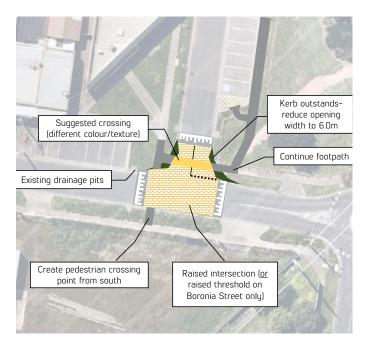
Alexander Avenue / Boronia Street proposed raised intersection
